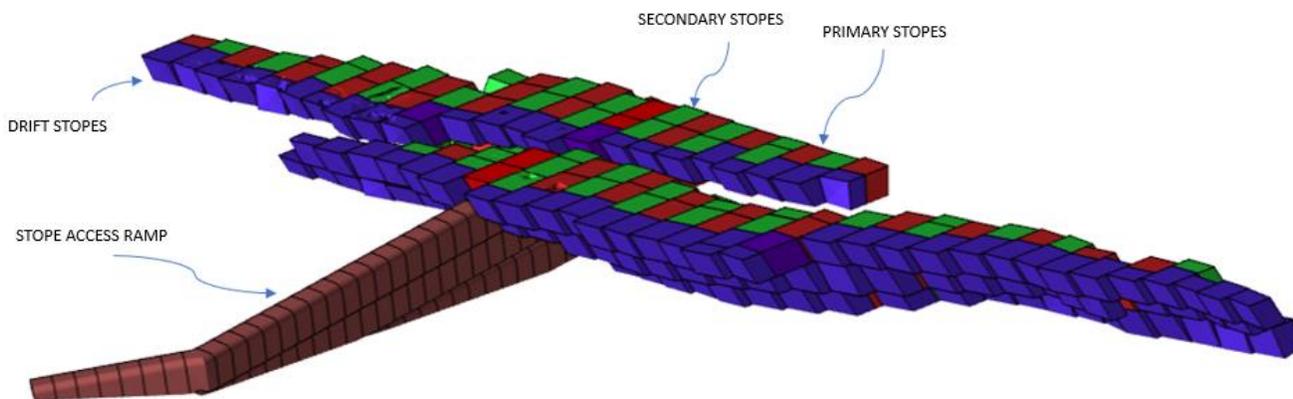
Schematic of Typical Transverse Cut-and-fill Stope Design at CLG
